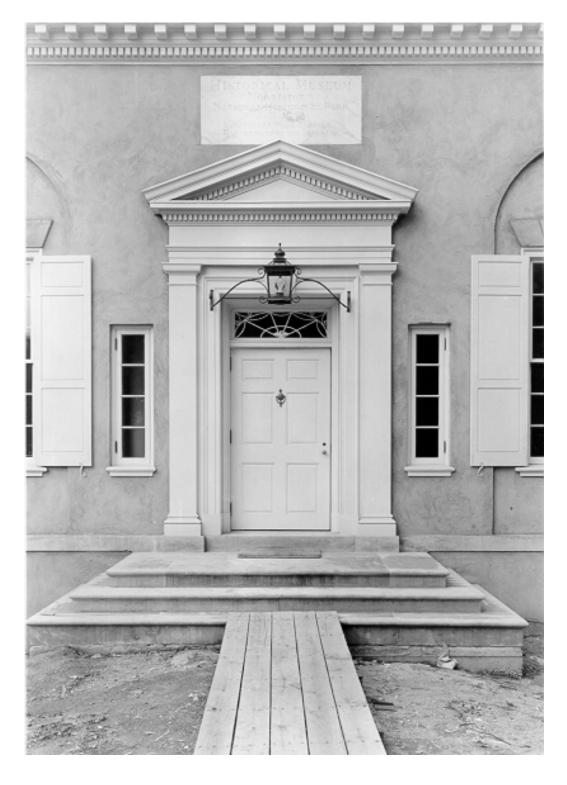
Morristown Museum Building: south façade, main entrance D101 (ca. March 1937).
